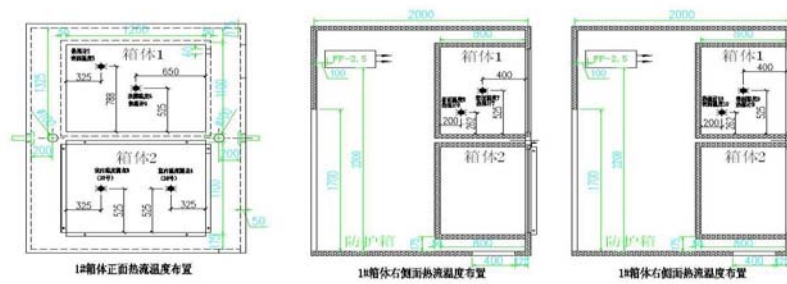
Arrangement plan of heat-flow measuring points for No.1 testing box
